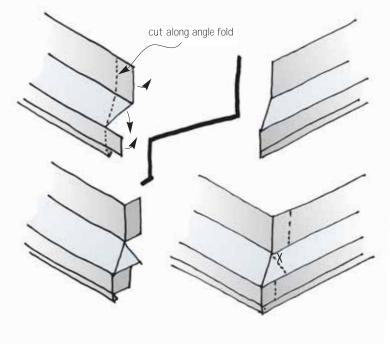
Horizontal joint in plywood sheet direct-fix cladding.
